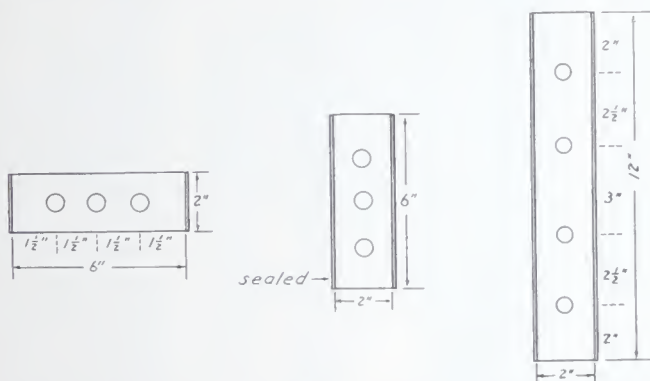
End views showing arrangement of gage plugs in specimens representing 2-in., 6-in. and 12-in. slabs
